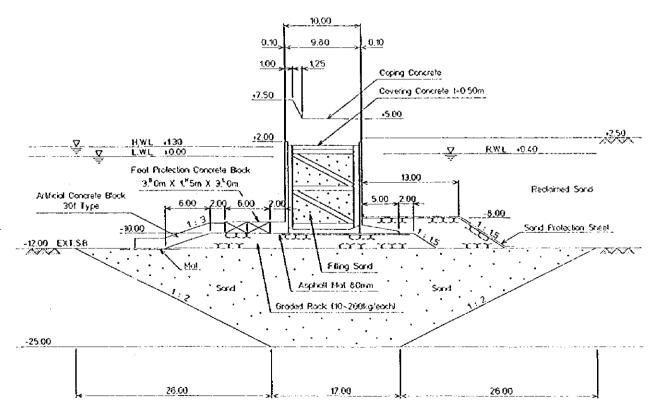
(2) Typical Cross Section of Seawall (Hybrid Caisson)
